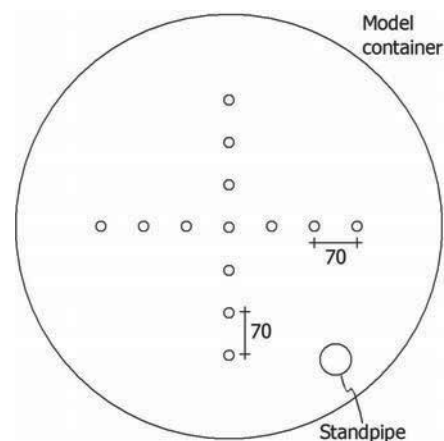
Typical pile layout in a single test week. At least four flights are completed at 140 mm pile spacing in each flight.
